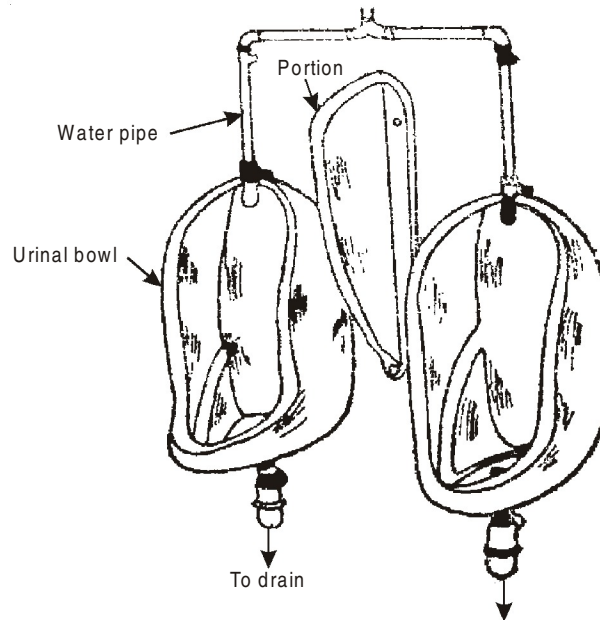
Isometric view of two bowl type urinals placed side by side.
